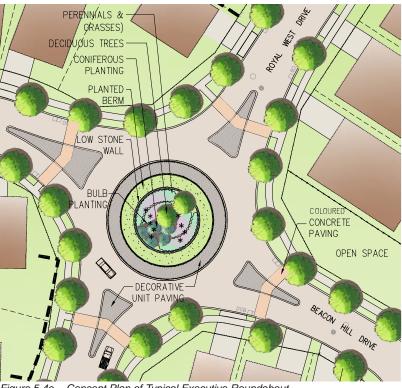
Concept Plan of Typical Executive Roundabout
